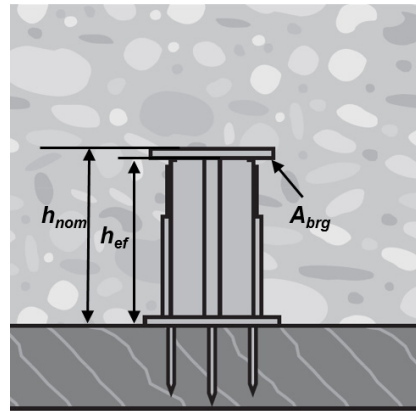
HILTI KWIK CAST KCS-WF ANCHOR INSTALLED IN CONCRETE
